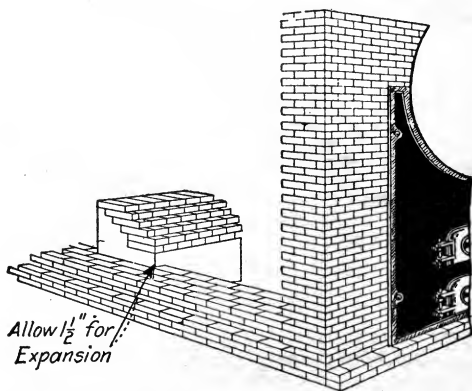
,270.—Detail of setting showing construction of bridge wall.
